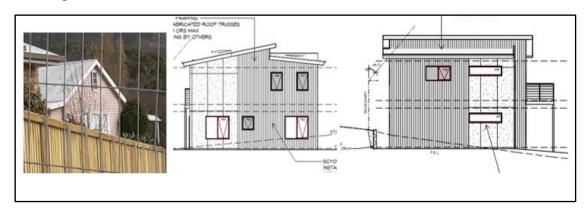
4 Merton Street and Unit 4 opposite – Elevation Prime Design
